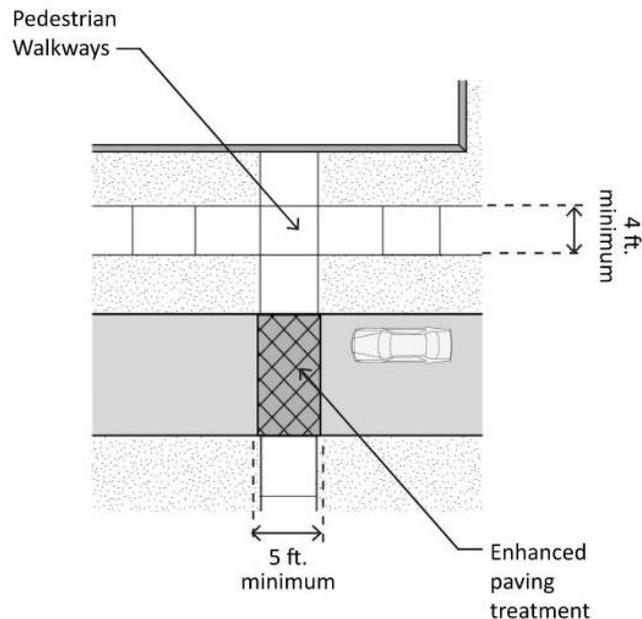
(B)(5): ENHANCED PAVING FOR ENTRANCE DRIVEWAYS
